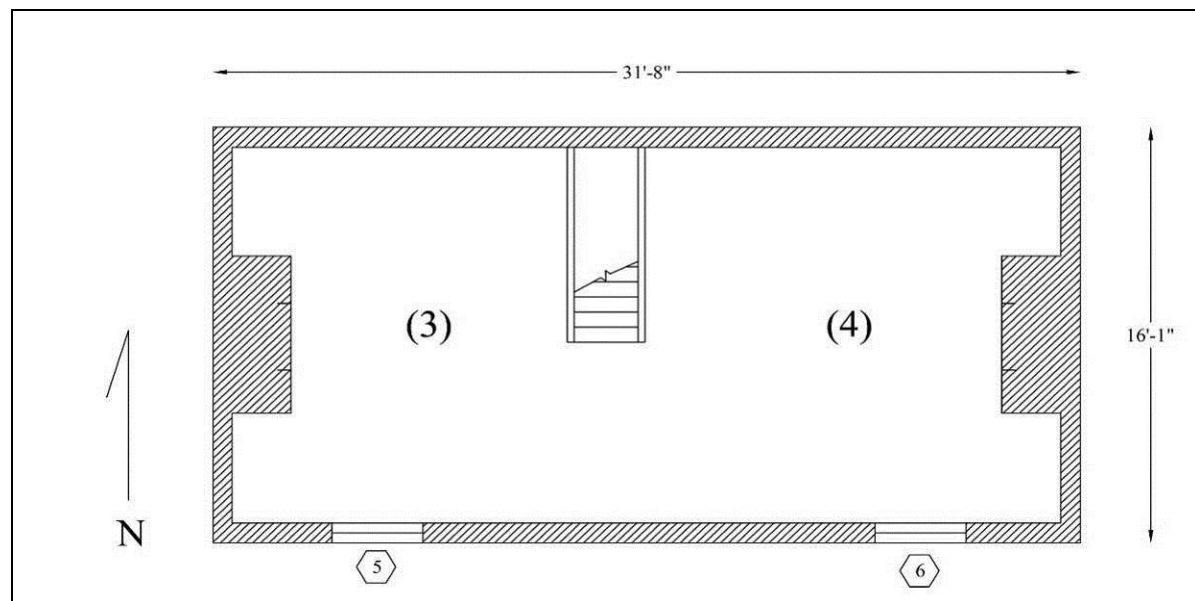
Sherwood Forest Kitchen/Quarter, Detailed Second Floor Plan.
